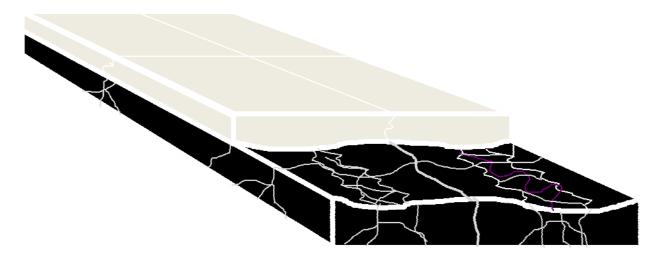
Typical unbonded concrete overlays of asphalt pavement
